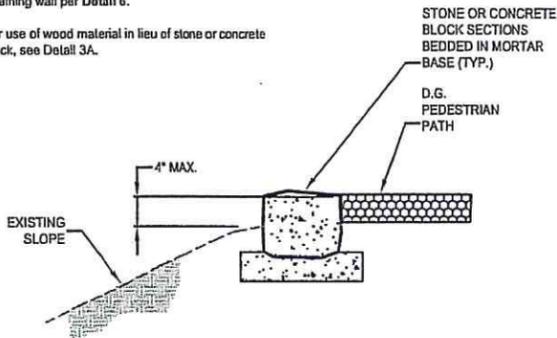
(NOT TO SCALE) (Refer to detail 3)
